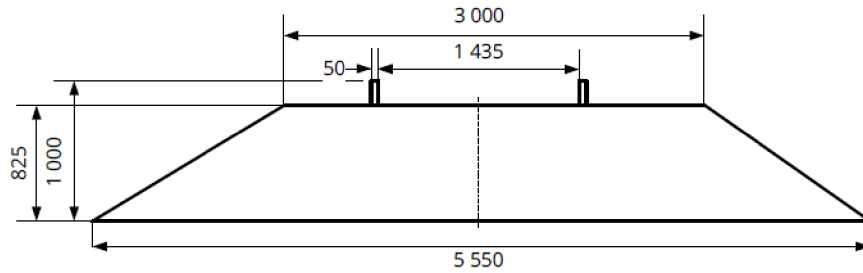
Single track ballast and rail ground configuration (dimensions in full-scale).
